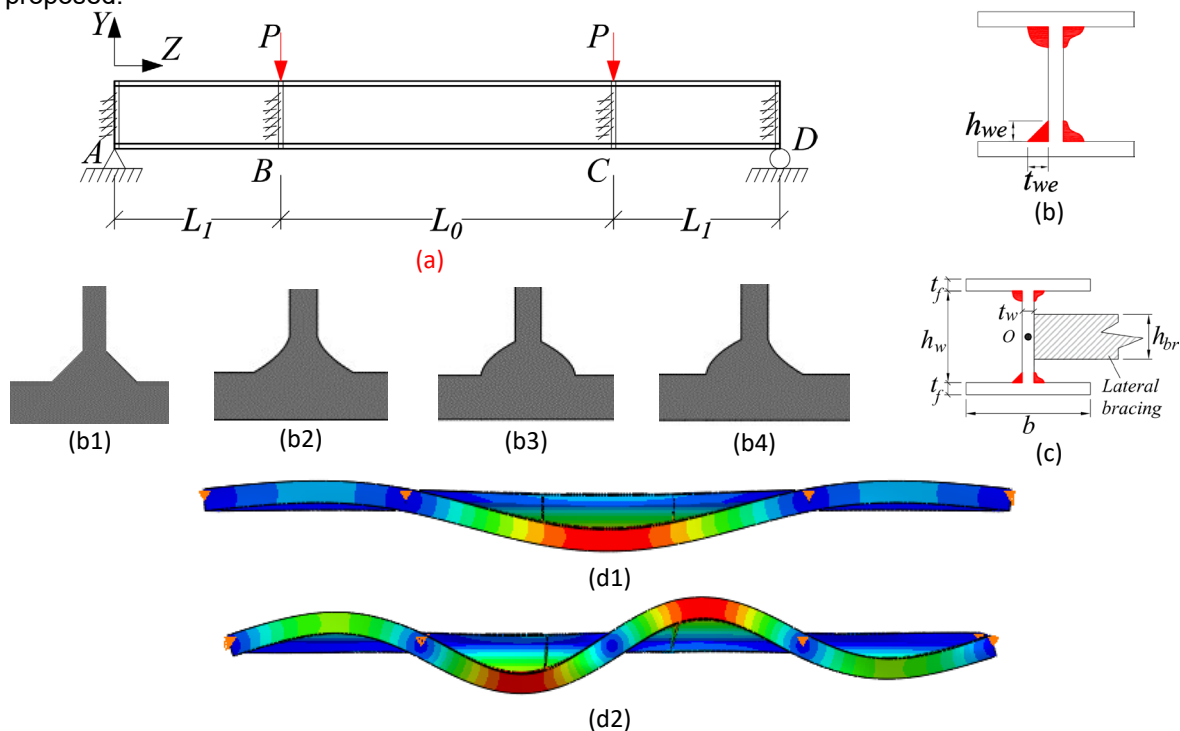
Definition of the beams with initial imperfections considered in this study (a) beam profile, (b) welds, (b1, b2, b3, b4) linear, concave, convex, and mixed weld shapes, (c) cross-sectional dimensions and cross bracing configurations, and (d1, d2) Magnified initial out-of-straightness shapes
